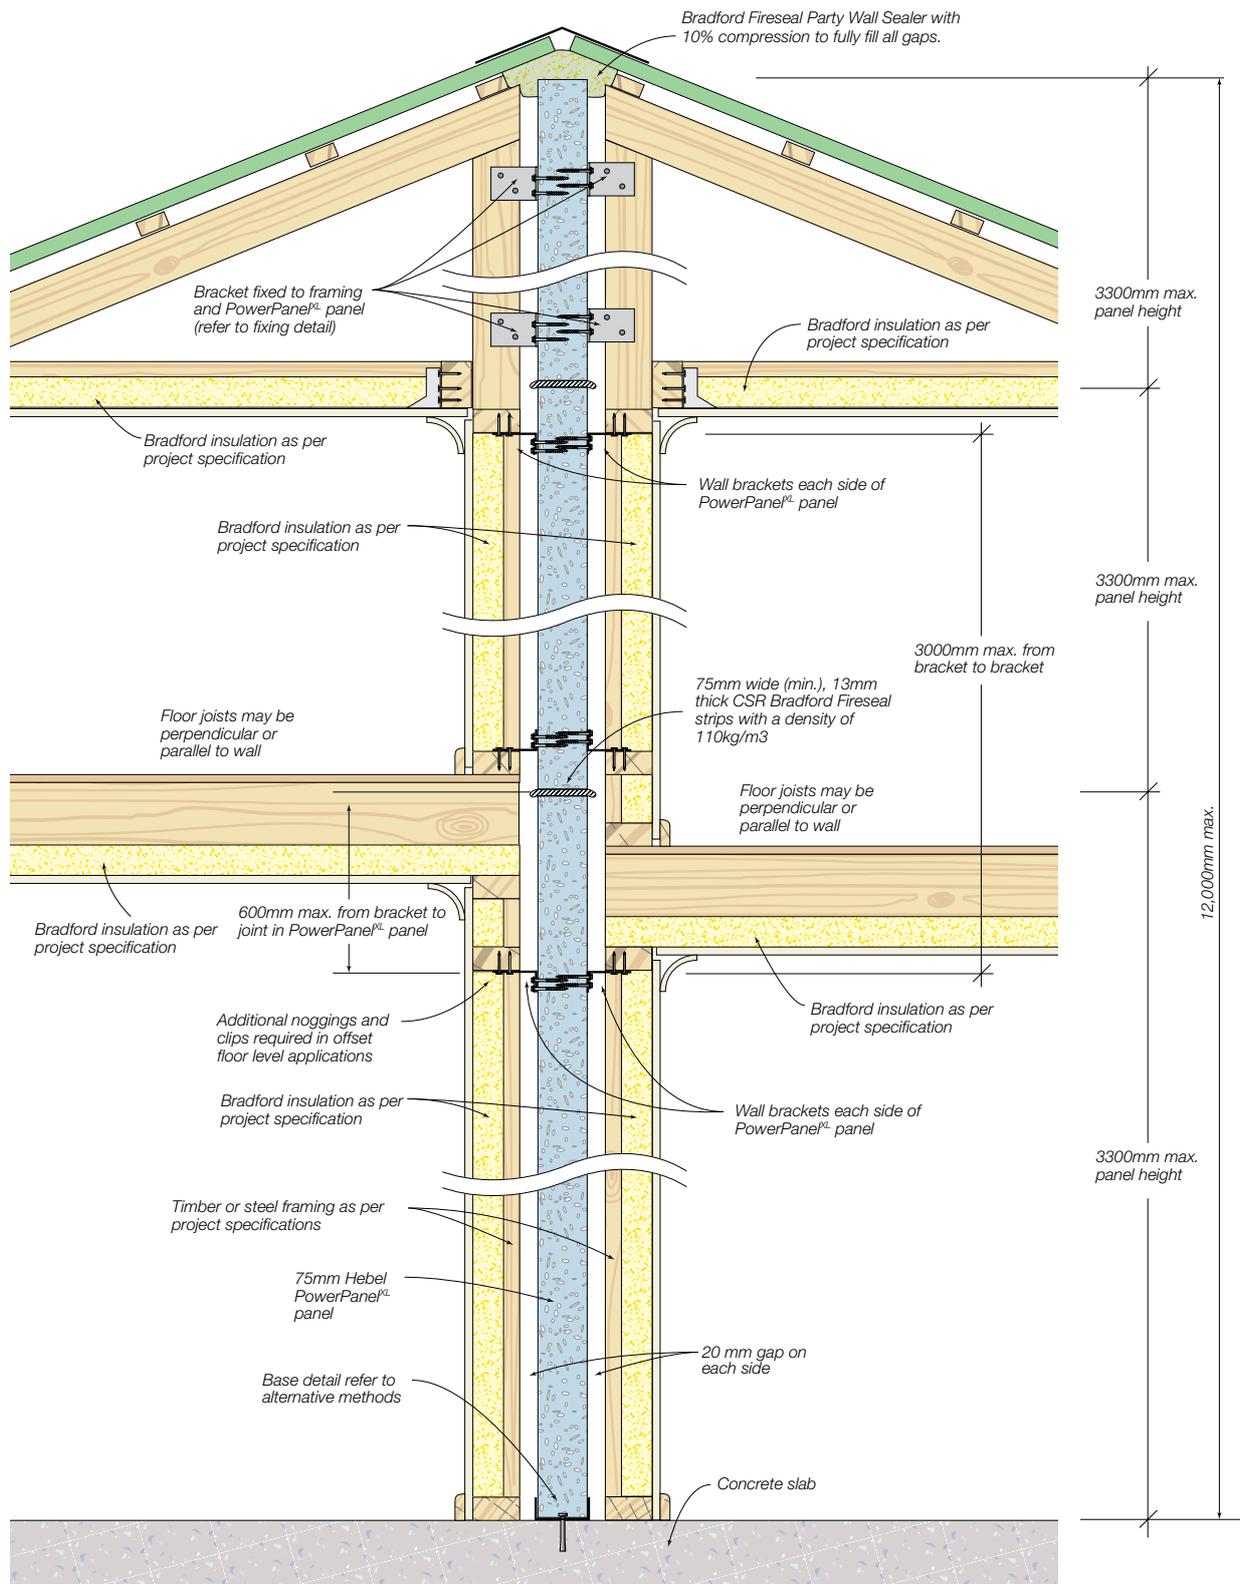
Vertical cross section of PowerPanel^{XL} Intertency Wall System
